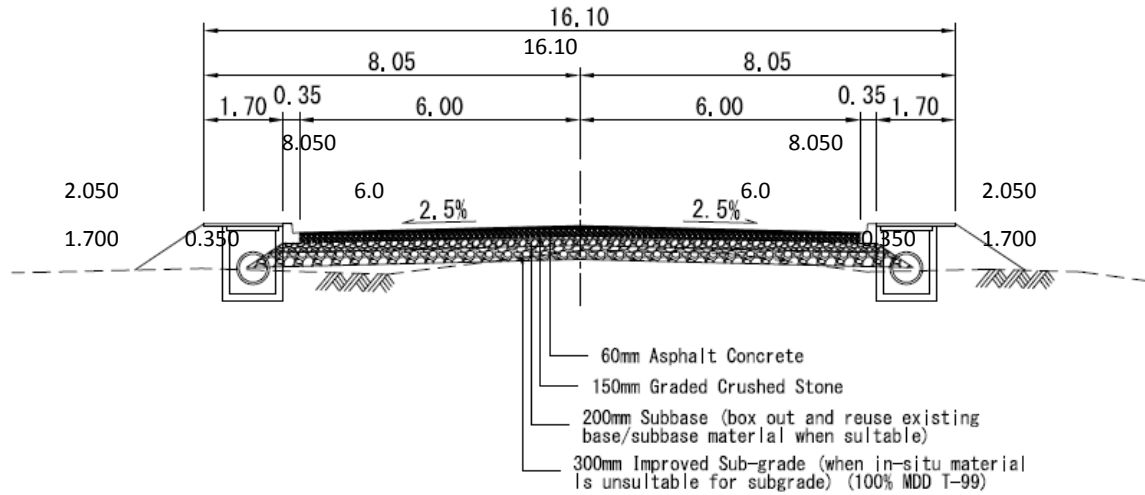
Typical Cross Section (Planned) Road C2 (Bridge No.1)
